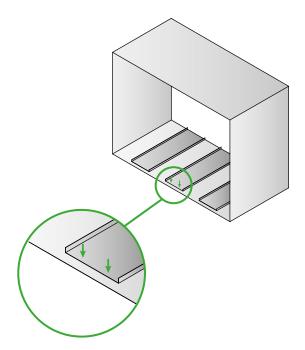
Mount the fastening rails to the duct using screws or pop rivets.
